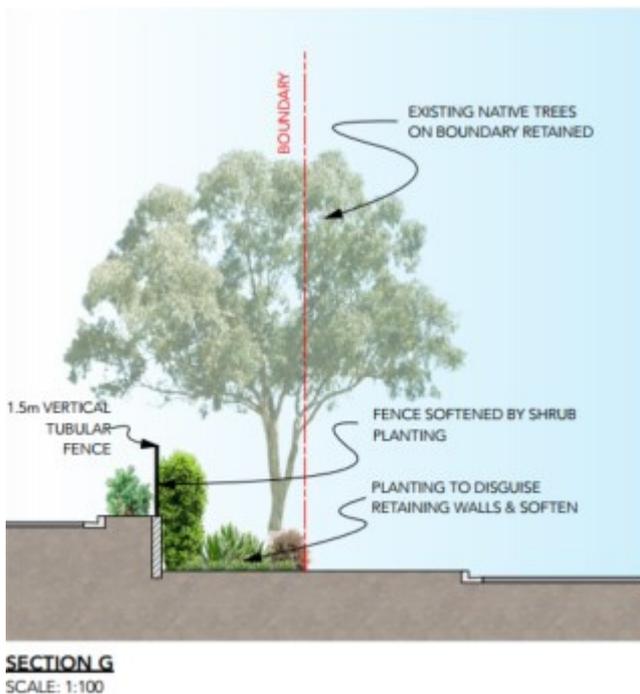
Tabernacle Road boundary cross section (Studio 151)
